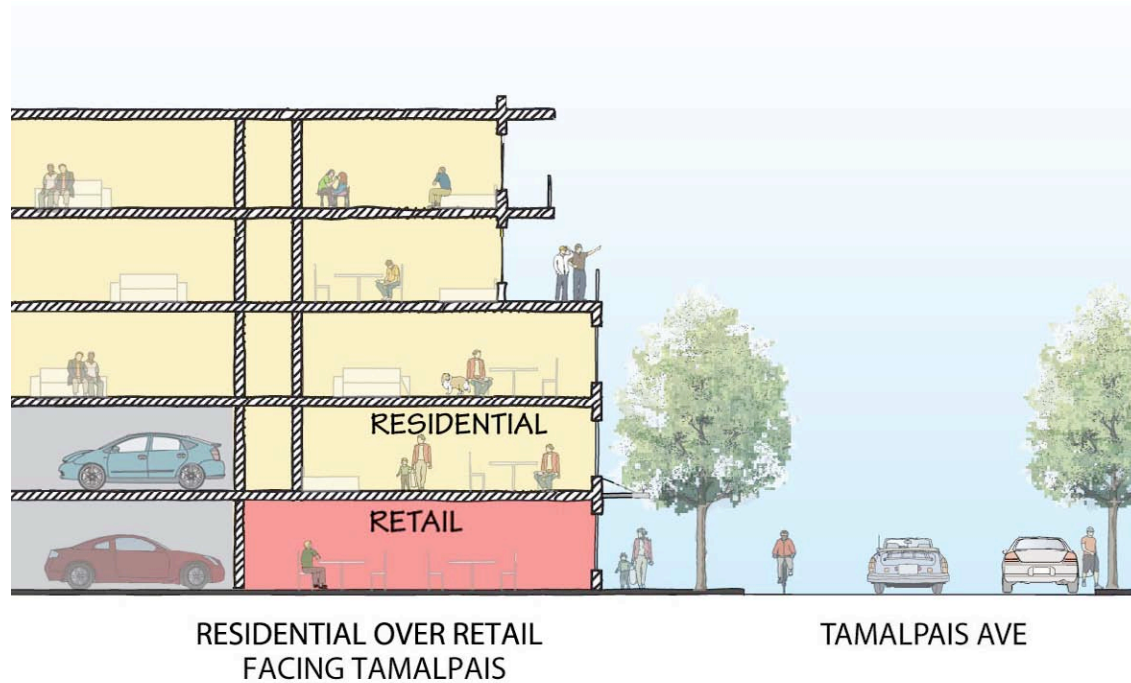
Site B Possible Redevelopment Concept – section looking north
